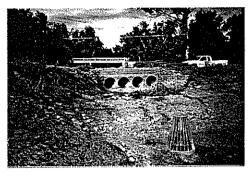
Gauging station on culverts on LN3 drain, EIA
